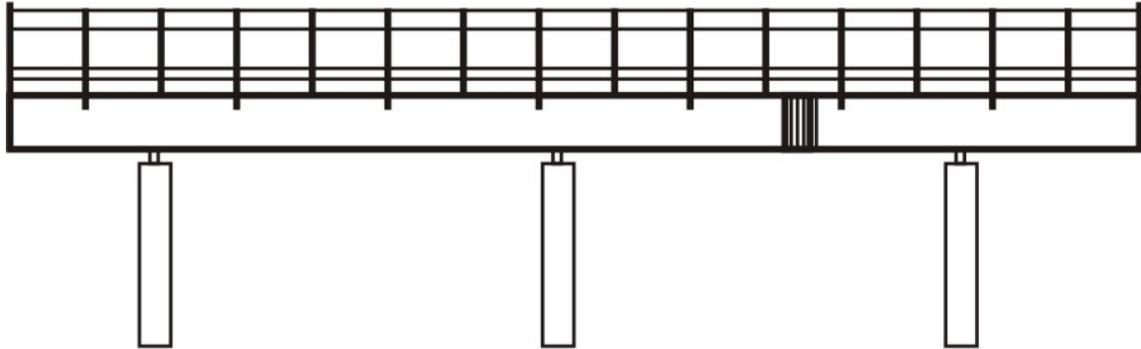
Parryville Bridge (1933), State Route 2008 over Pohapoco Creek, Parryville, Pennsylvania. This bridge is an example of the metal rolled multi-beam type.
